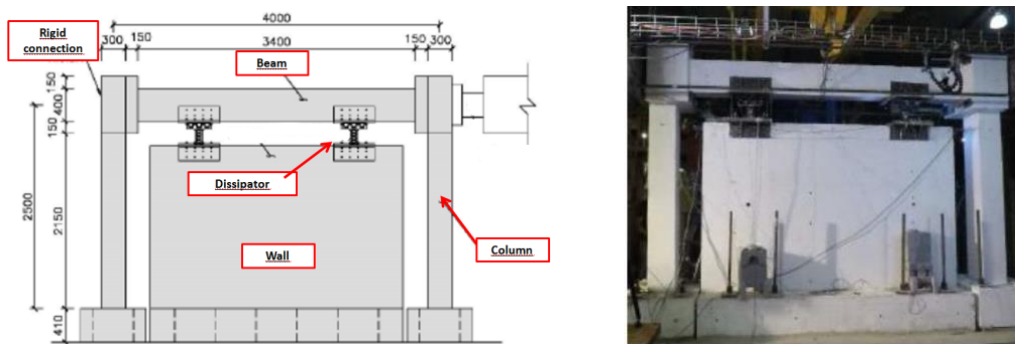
Geometry of the reinforced concrete frame, UNAM laboratory
